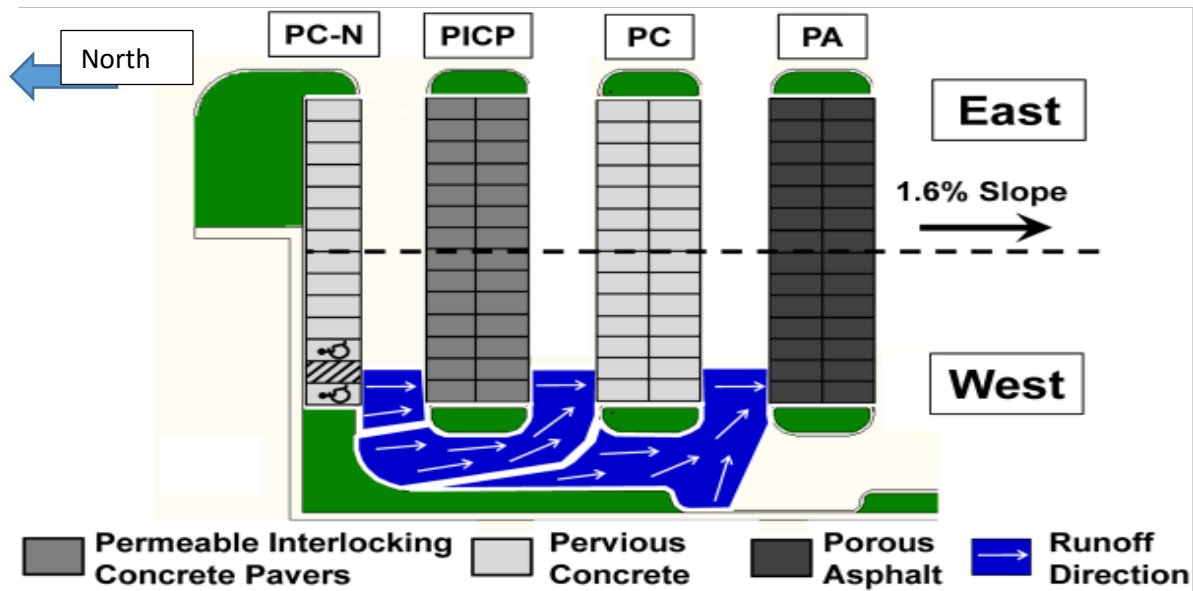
Parking lot's plan view depicting permeable pavement types: the north pervious concrete (PC-N), permeable interlocking concrete pavers (PICP), pervious concrete (PC) and porous asphalt (PA). New PICP (PICP_NEW) replaced the PC and PC-N in 2016. Adapted from Brown and Borst [2014].
